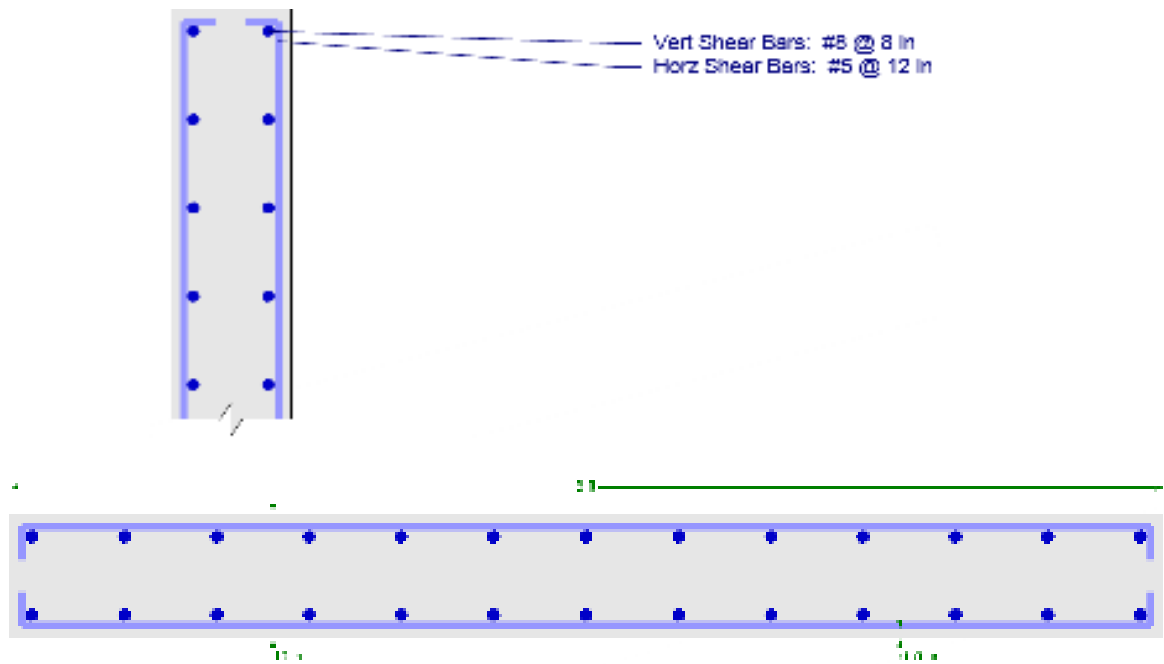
Sample Ordinary RC Shear wall Reinforcement Details for 6-Story Buildings (B4-6S-L-O); Wall Section for Floors 1-3
